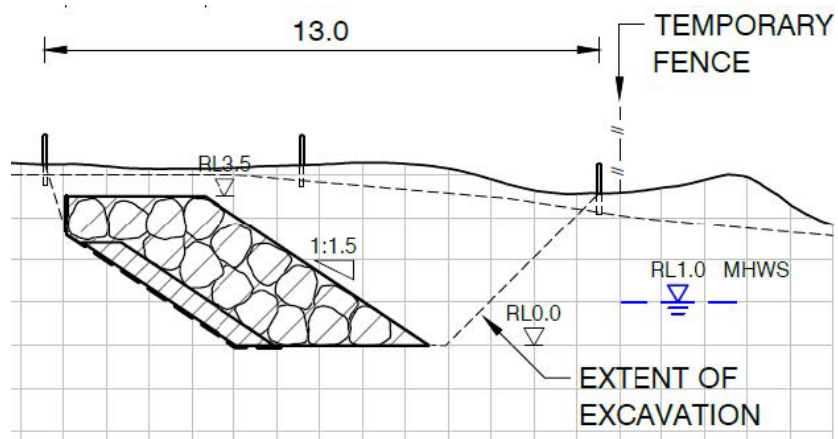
Indicative excavation to place wall (Figure 5.0b from the Construction Methodology Statement, Davis Coastal Consultants, October 2024; page 10).
